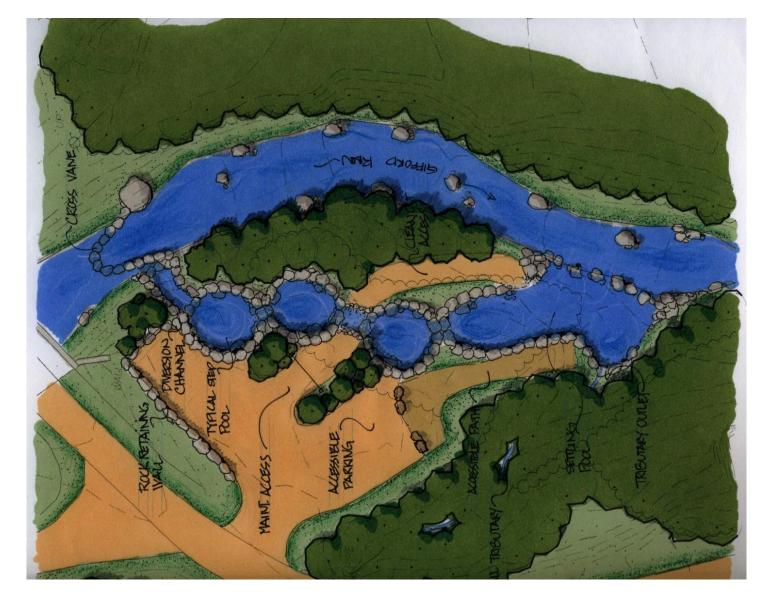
High Flow Buffer Channel Plan at Merrill Road
